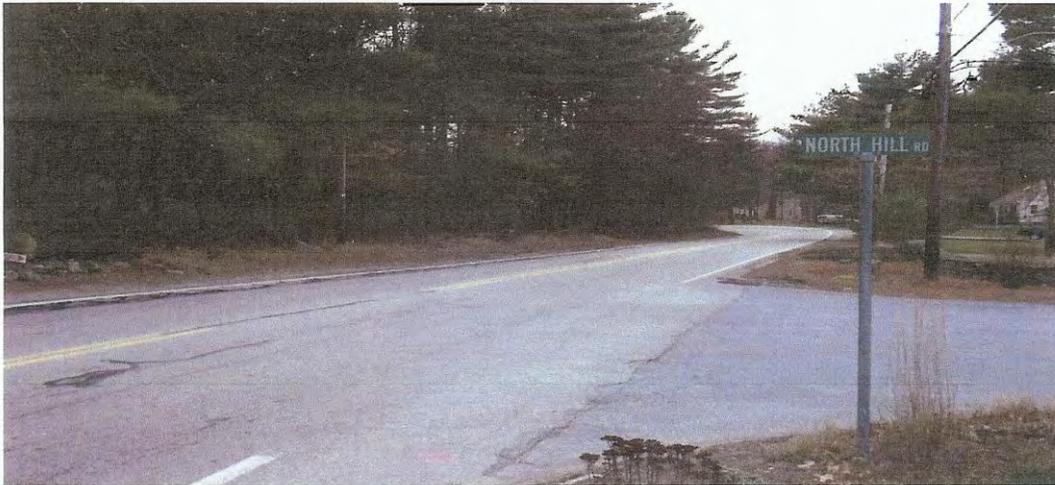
Tyngsboro Road viewed from the end of North Hill Road.
